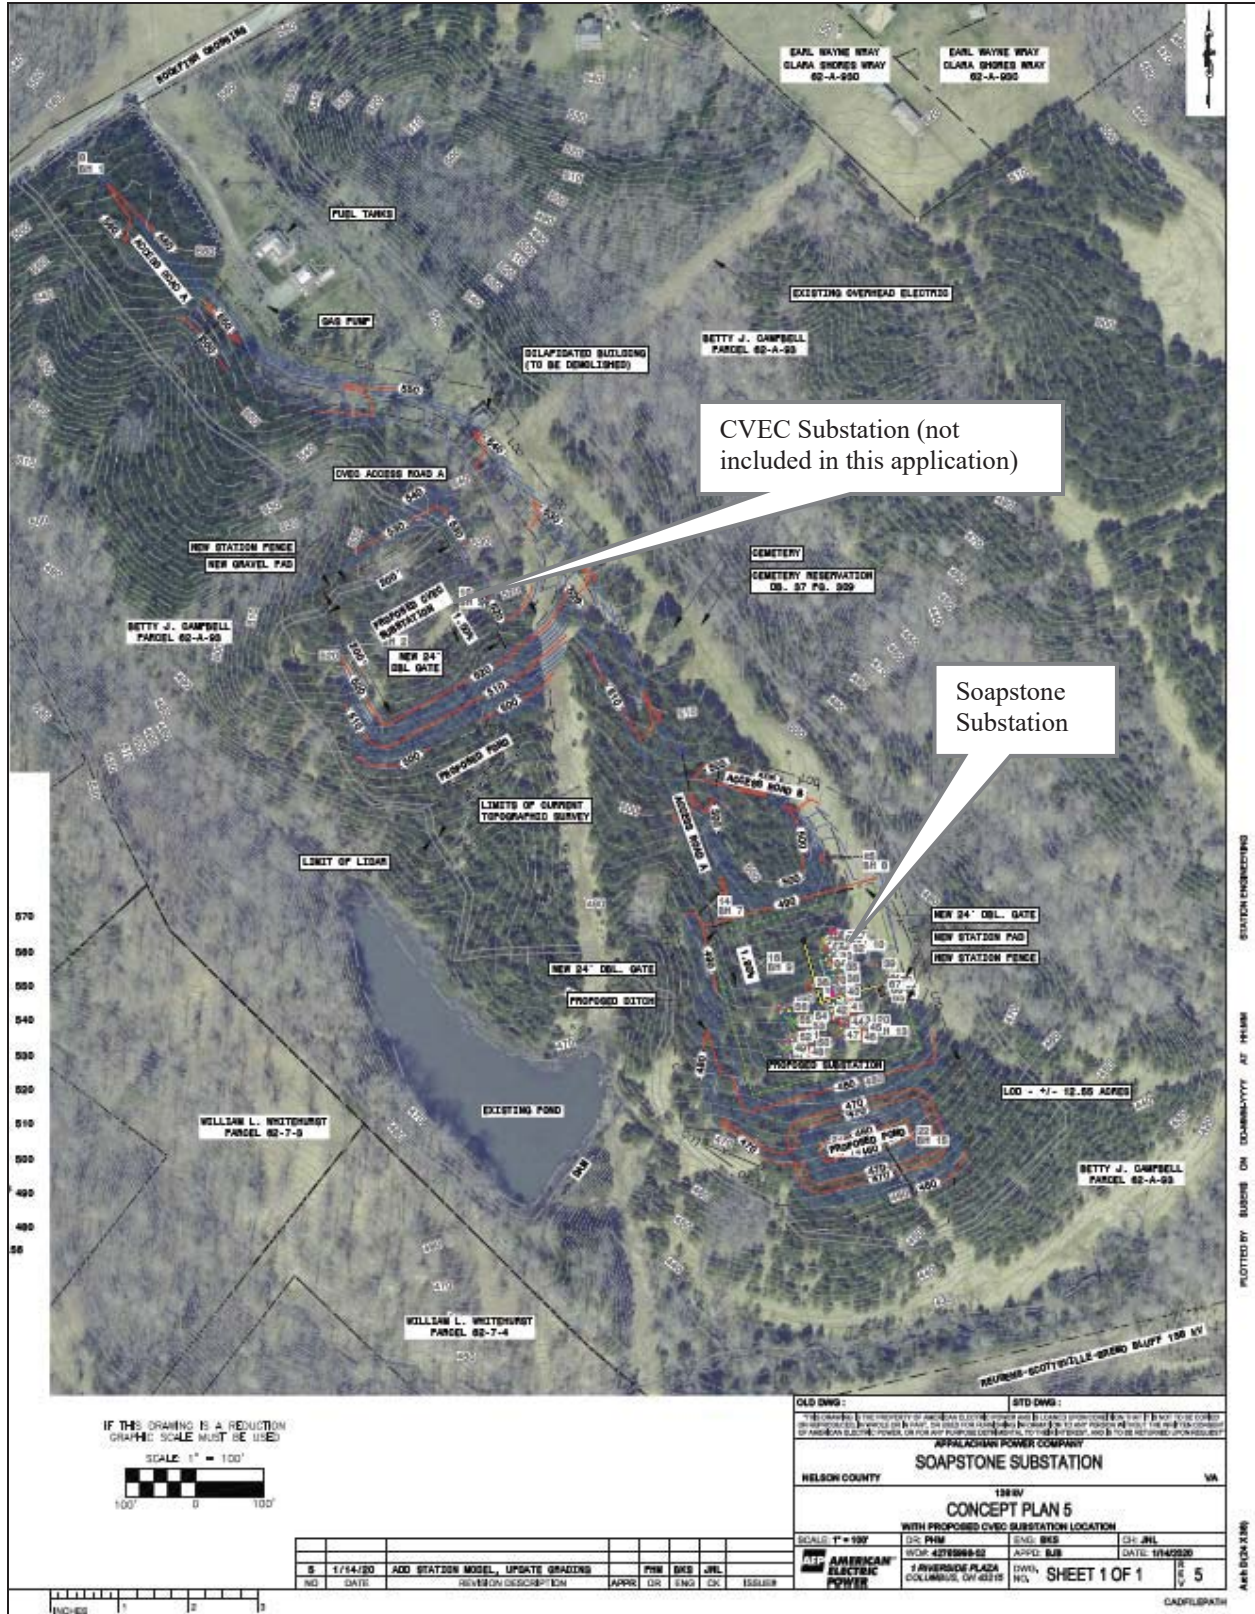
Preliminary Site Plan and schematics. Source: POWER Engineers, Inc.
